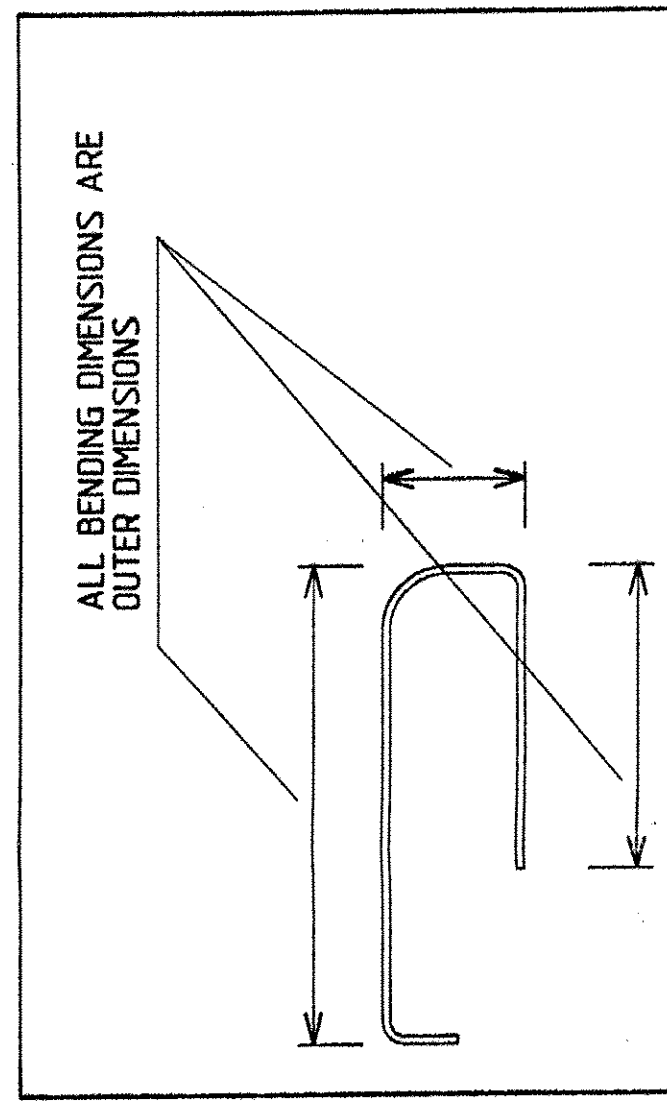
DETAIL BUCKET OF FOUNDATIONS <F1> <F2> <F3>
